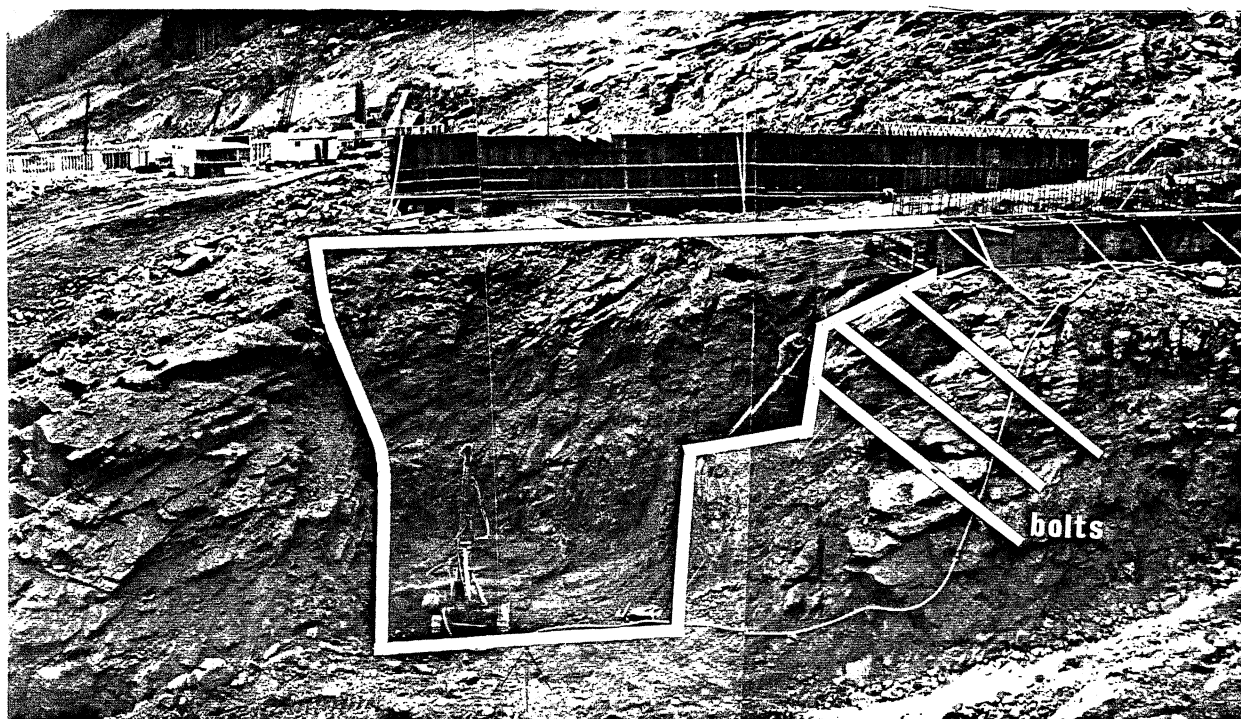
Ottomite Bridge north pier showing fault zone excavation and rock bolt locations.
